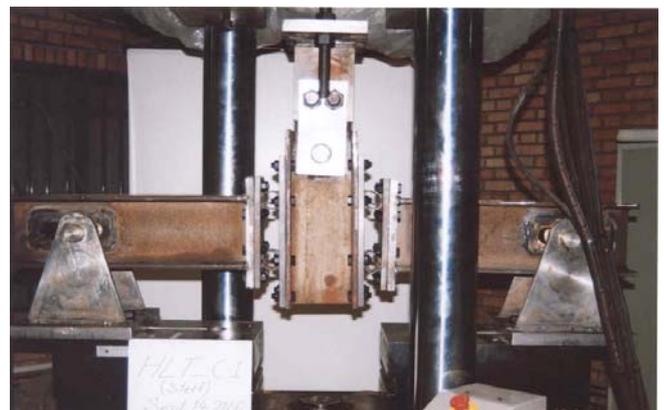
First test assembly, with HLT-C1 specimens, at its utmost upper position, before failure.
